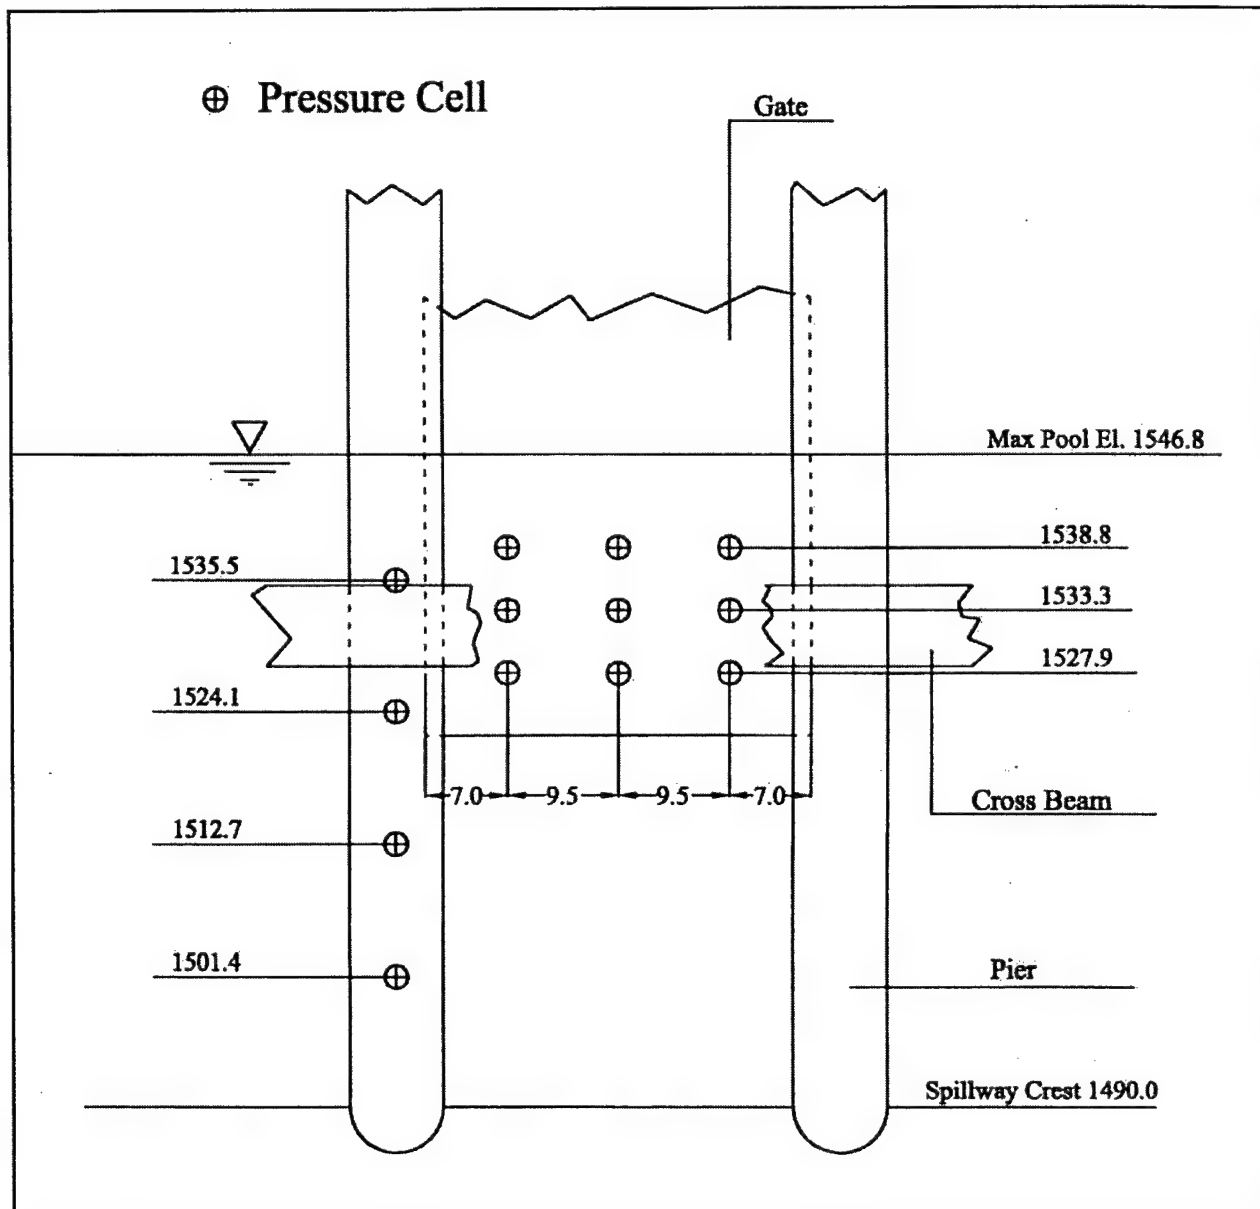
Spill gate and pier pressure cell locations, looking downstream
